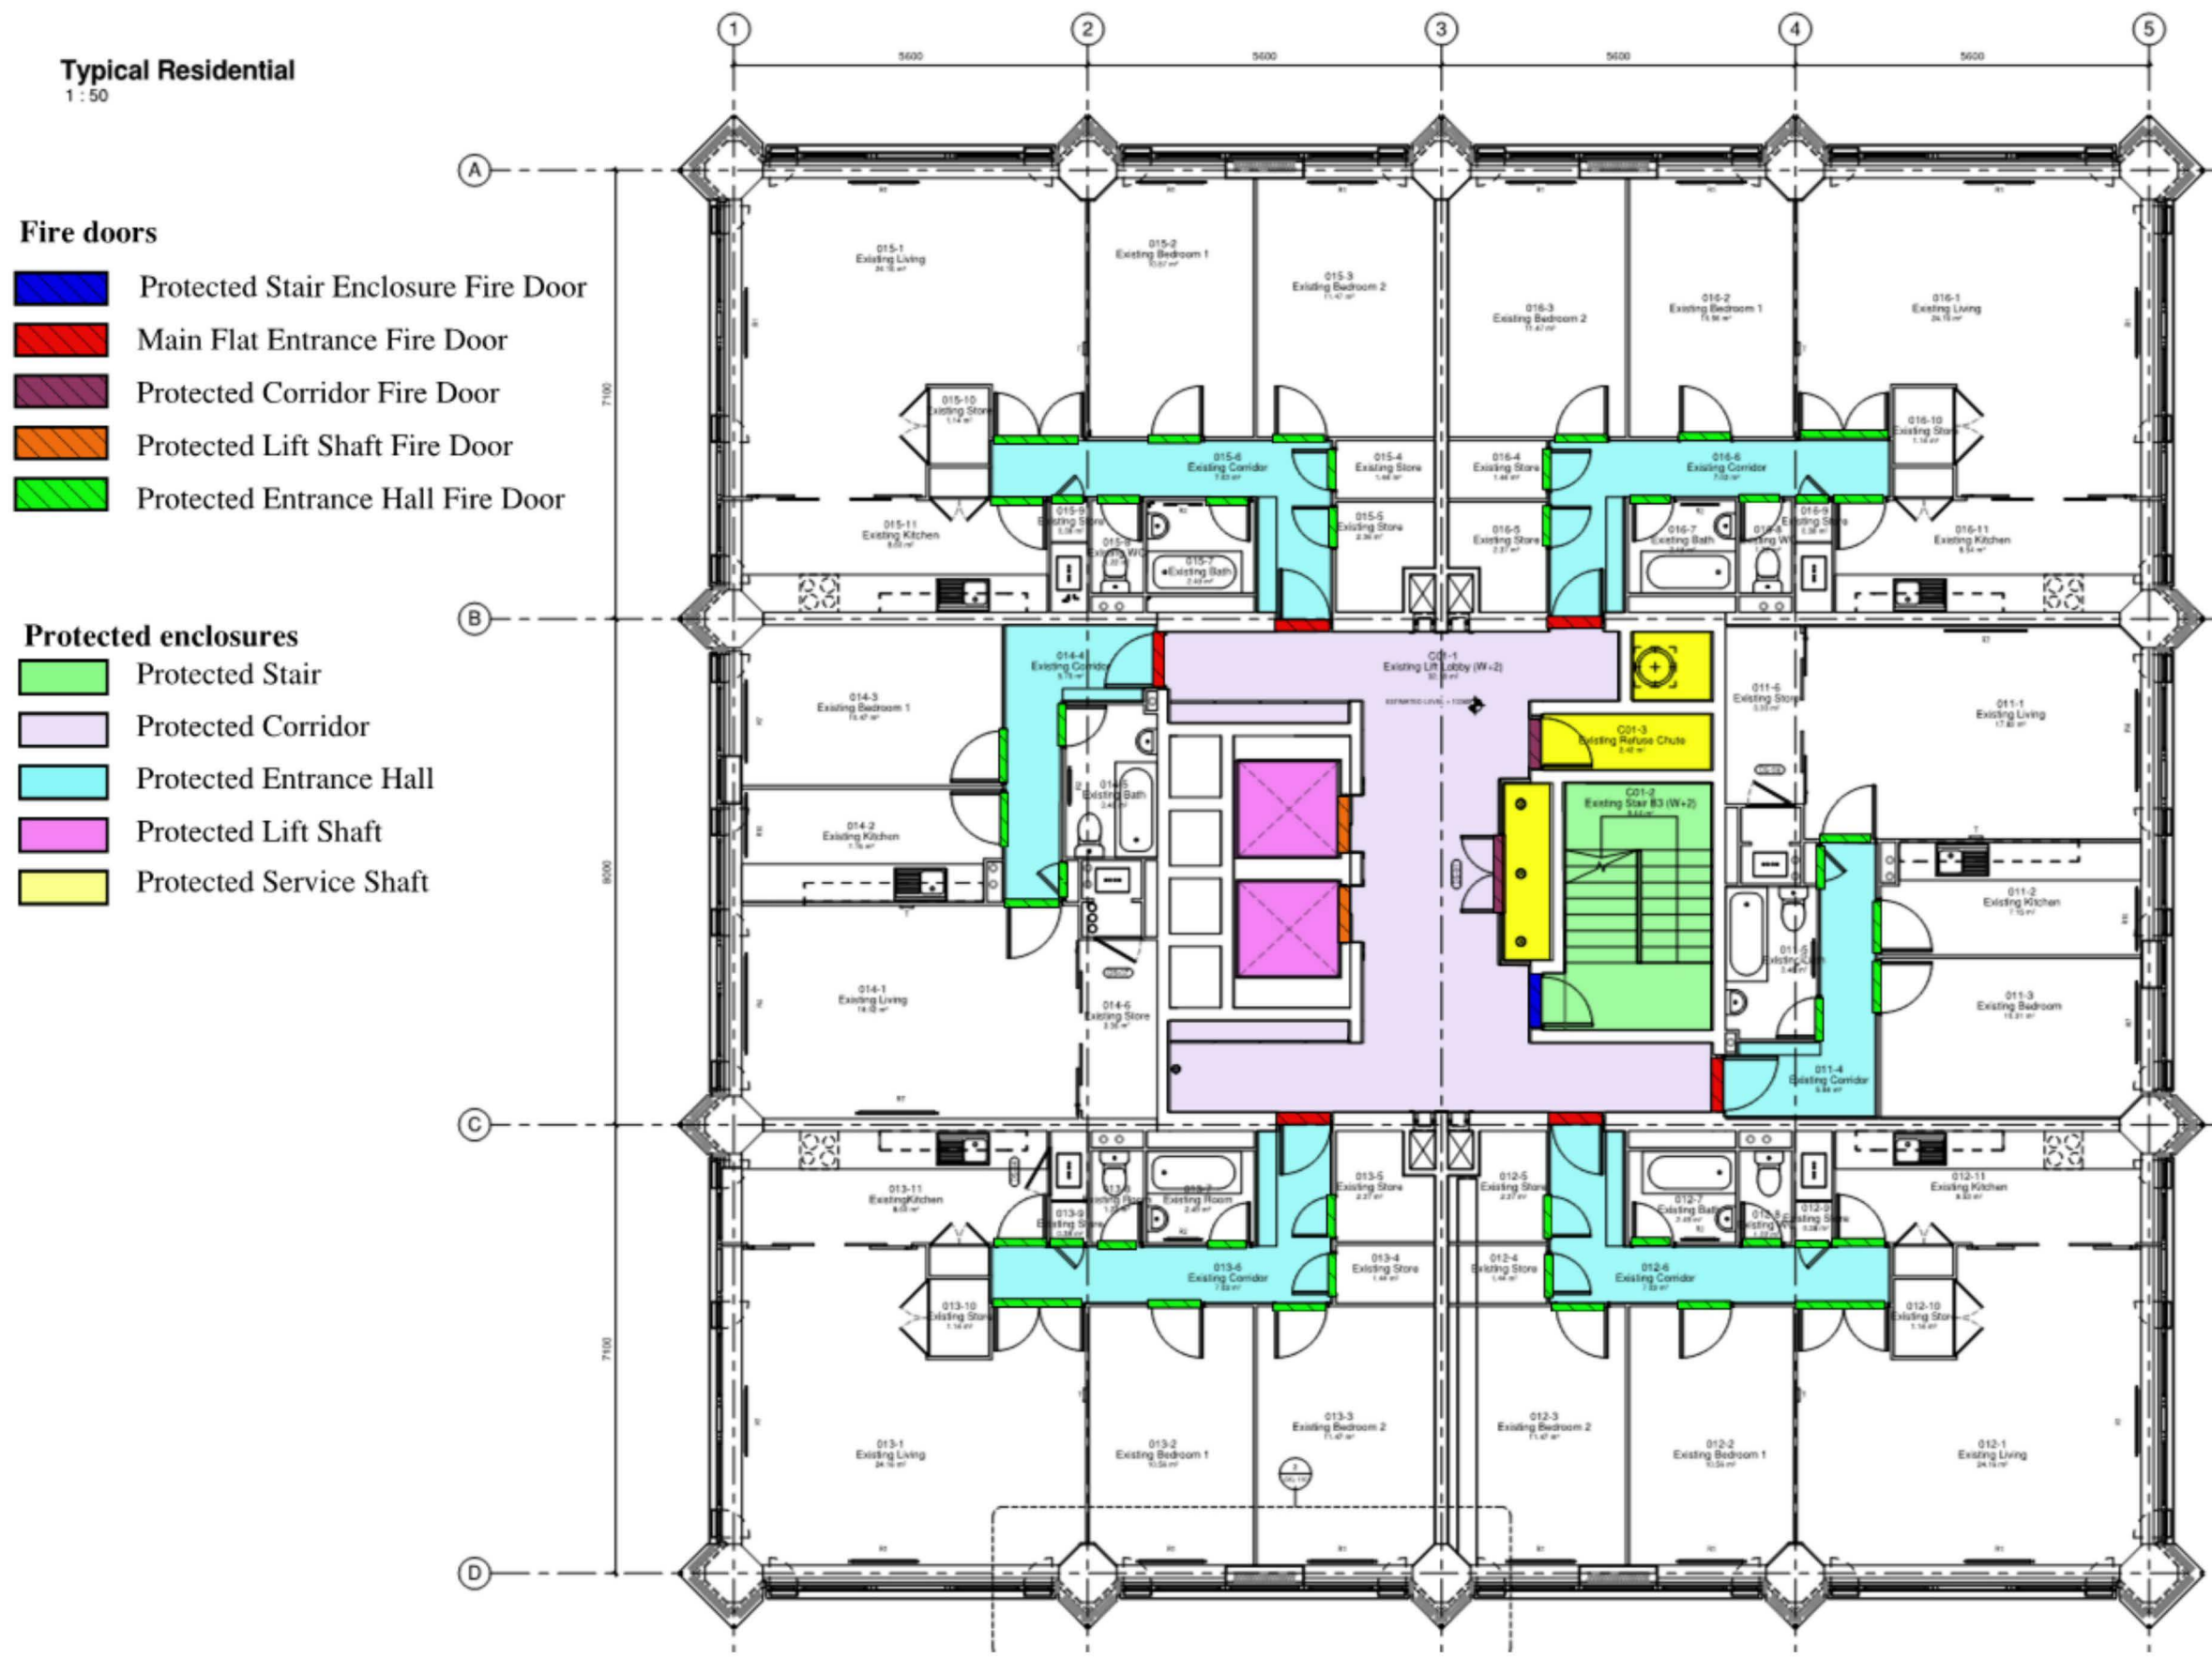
Indicative locations of types of fire doors on a typical residential floor(SEA00010474)
